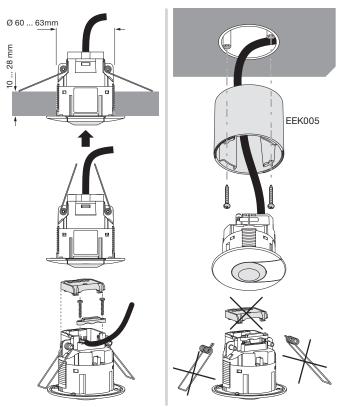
Installation in suspended ceiling or in wall-mounted housing
